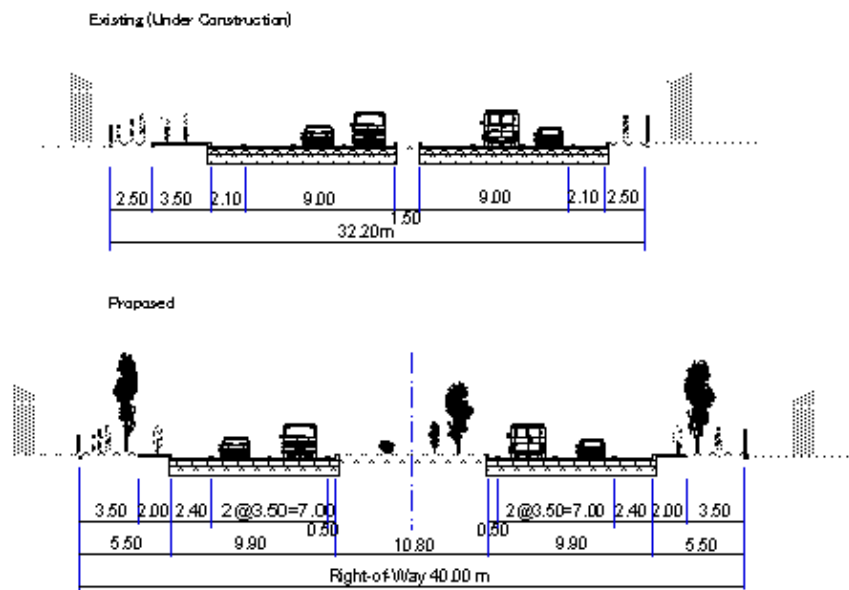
Proposed Cross Section for Av. Primeiro de Dezembro
